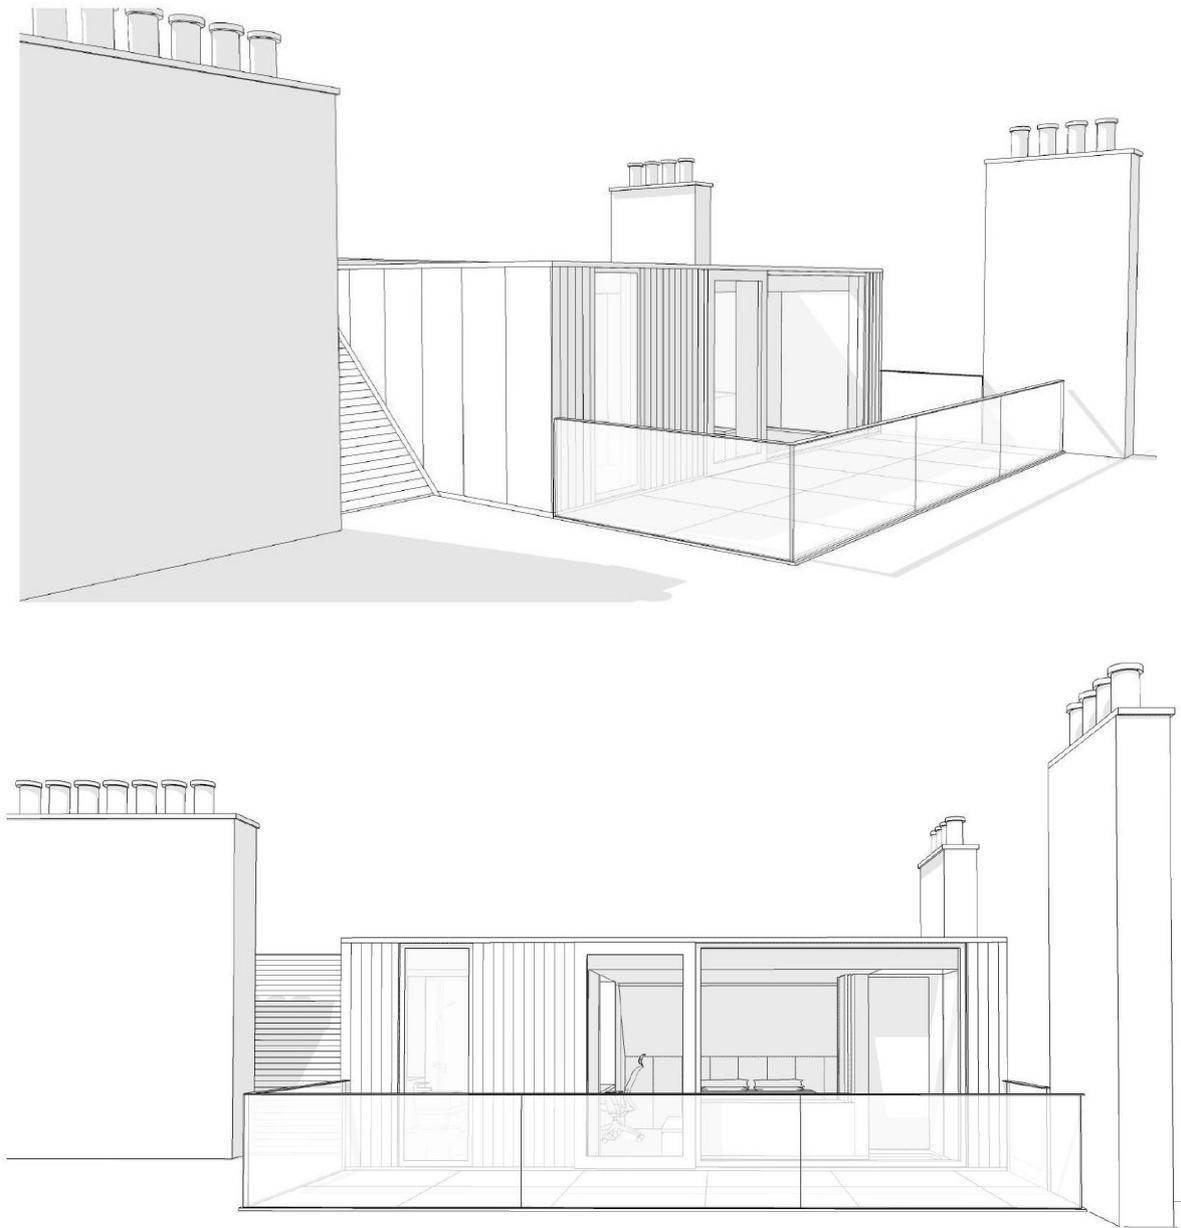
3D views of proposals to 3F2 Piershill Terrace from design statement submitted to council
